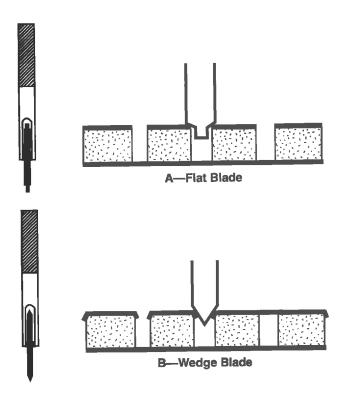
KerfKore® tool. A—This flat blade tool strips the brown paper backing from both sides of the groove area and permits maximum bending. B—The wedge shape tool slices the backing paper and wedges it into the groove. Although faster, the minimum radius achievable is less. (Interior Products, Inc.)
